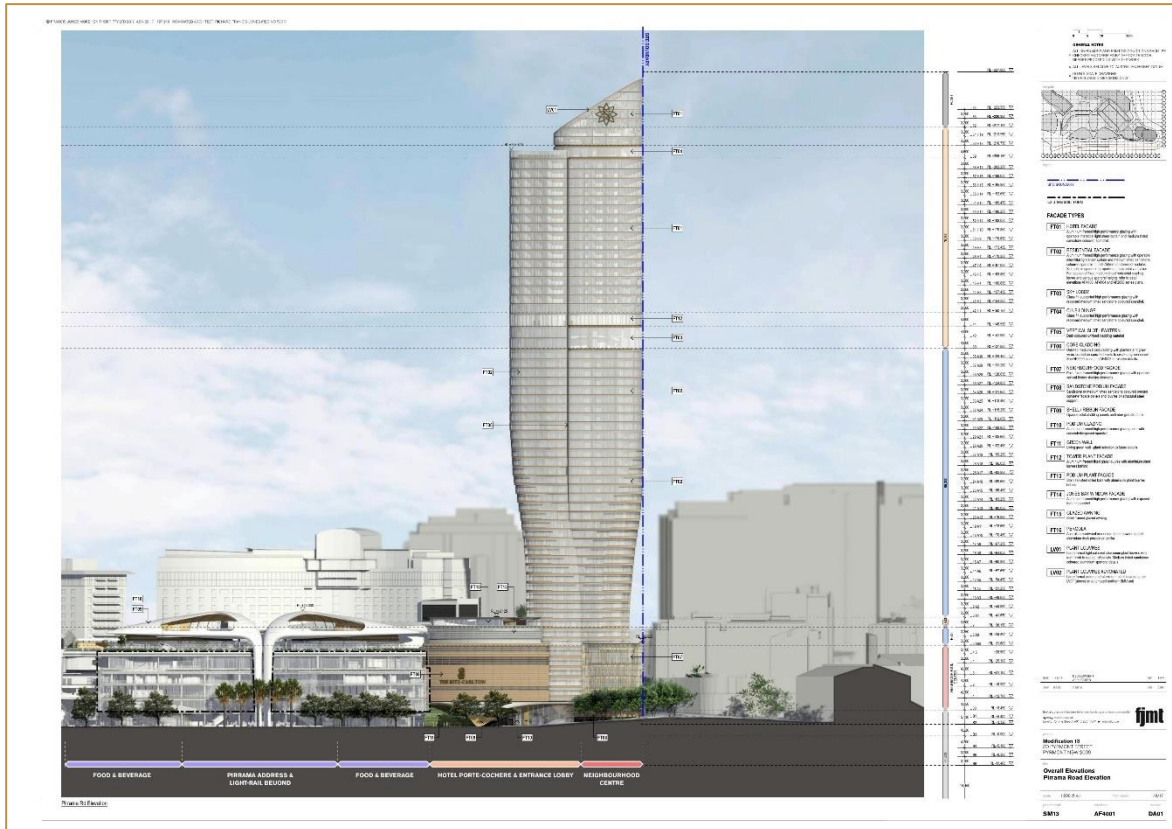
EASTERN AND PIRRAMA ROAD ELEVATION
